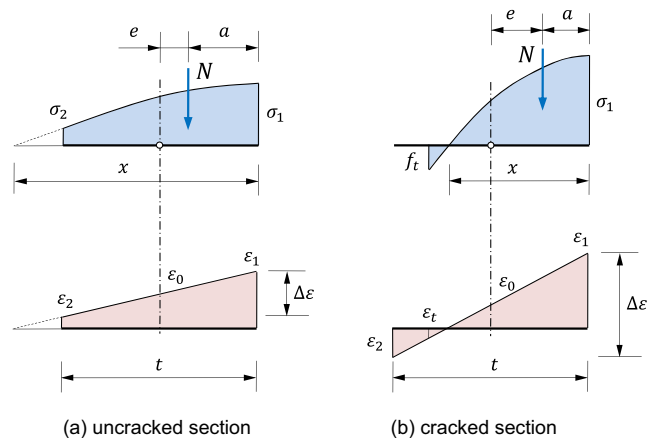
The stress and strain state in the cross section of masonry wall under flexural deformation.
